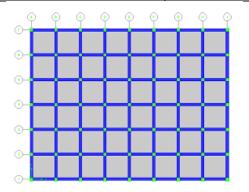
Plan of Rectangular Shaped RC and GFRG Building
